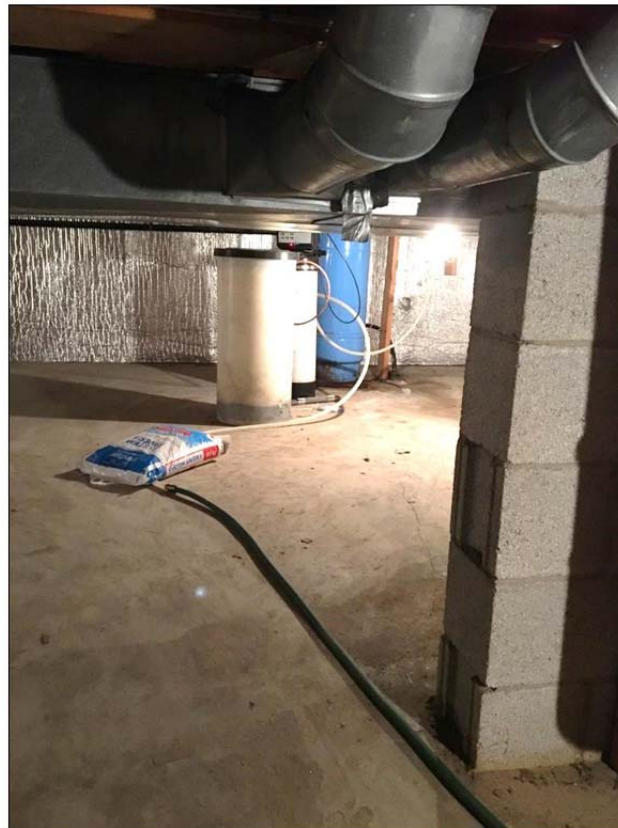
Sampling and Flow Rate Testing Location (as on 7-March-2018)
